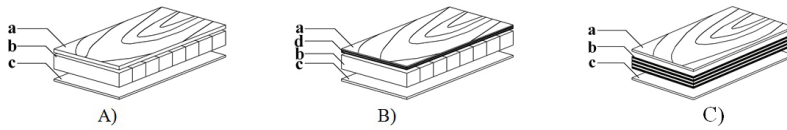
Three forms of structure A), B), and C) of engineered wood flooring: a) decorative face (upper) veneer, b) core board, c) back (lower) plywood, and d) plywood
